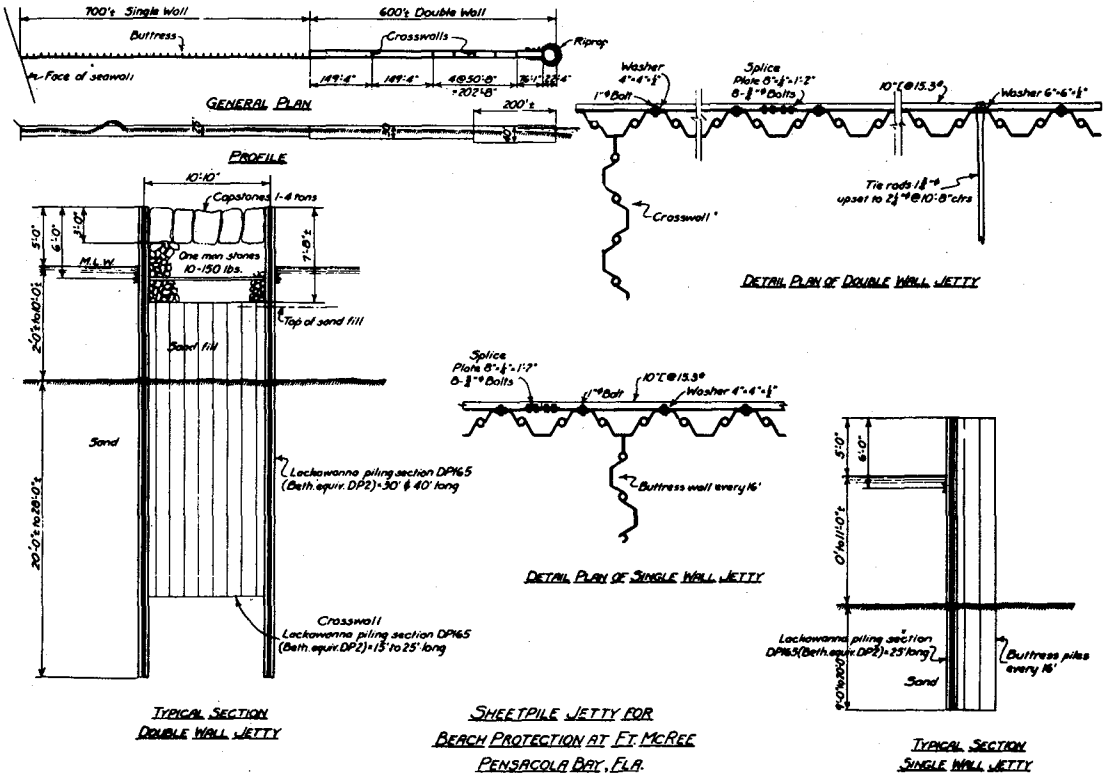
Sheetpile Jetty for Beach Protection at Ft. McRee, Pensacola Bay, Fla.
